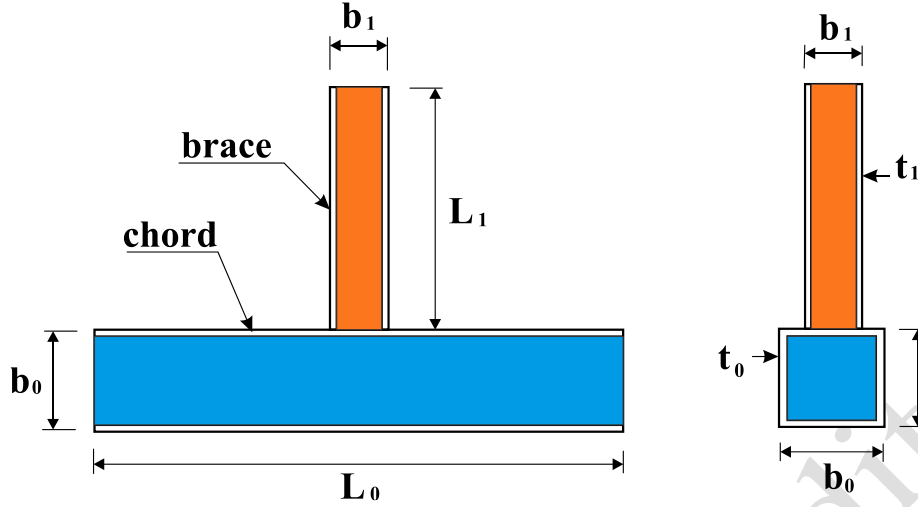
Geometry details of T-joint with square cross-section in chord and brace
